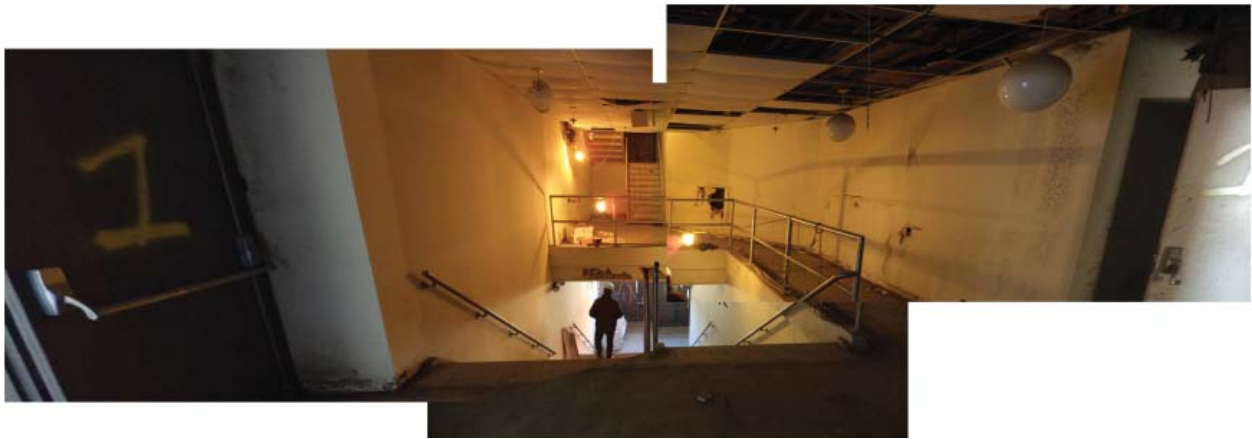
1913 Hotel: stairs to ground from ballroom.
